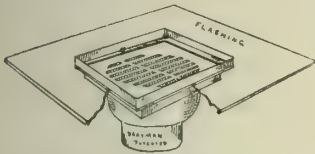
TILE AND GRAVEL ROOF DRAIN
